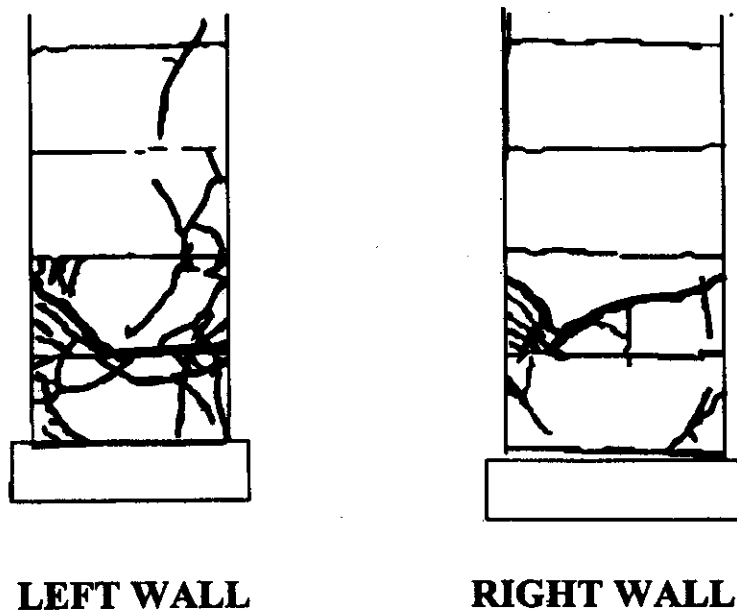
Crack pattern of the CAMUS I specimen after the last test
